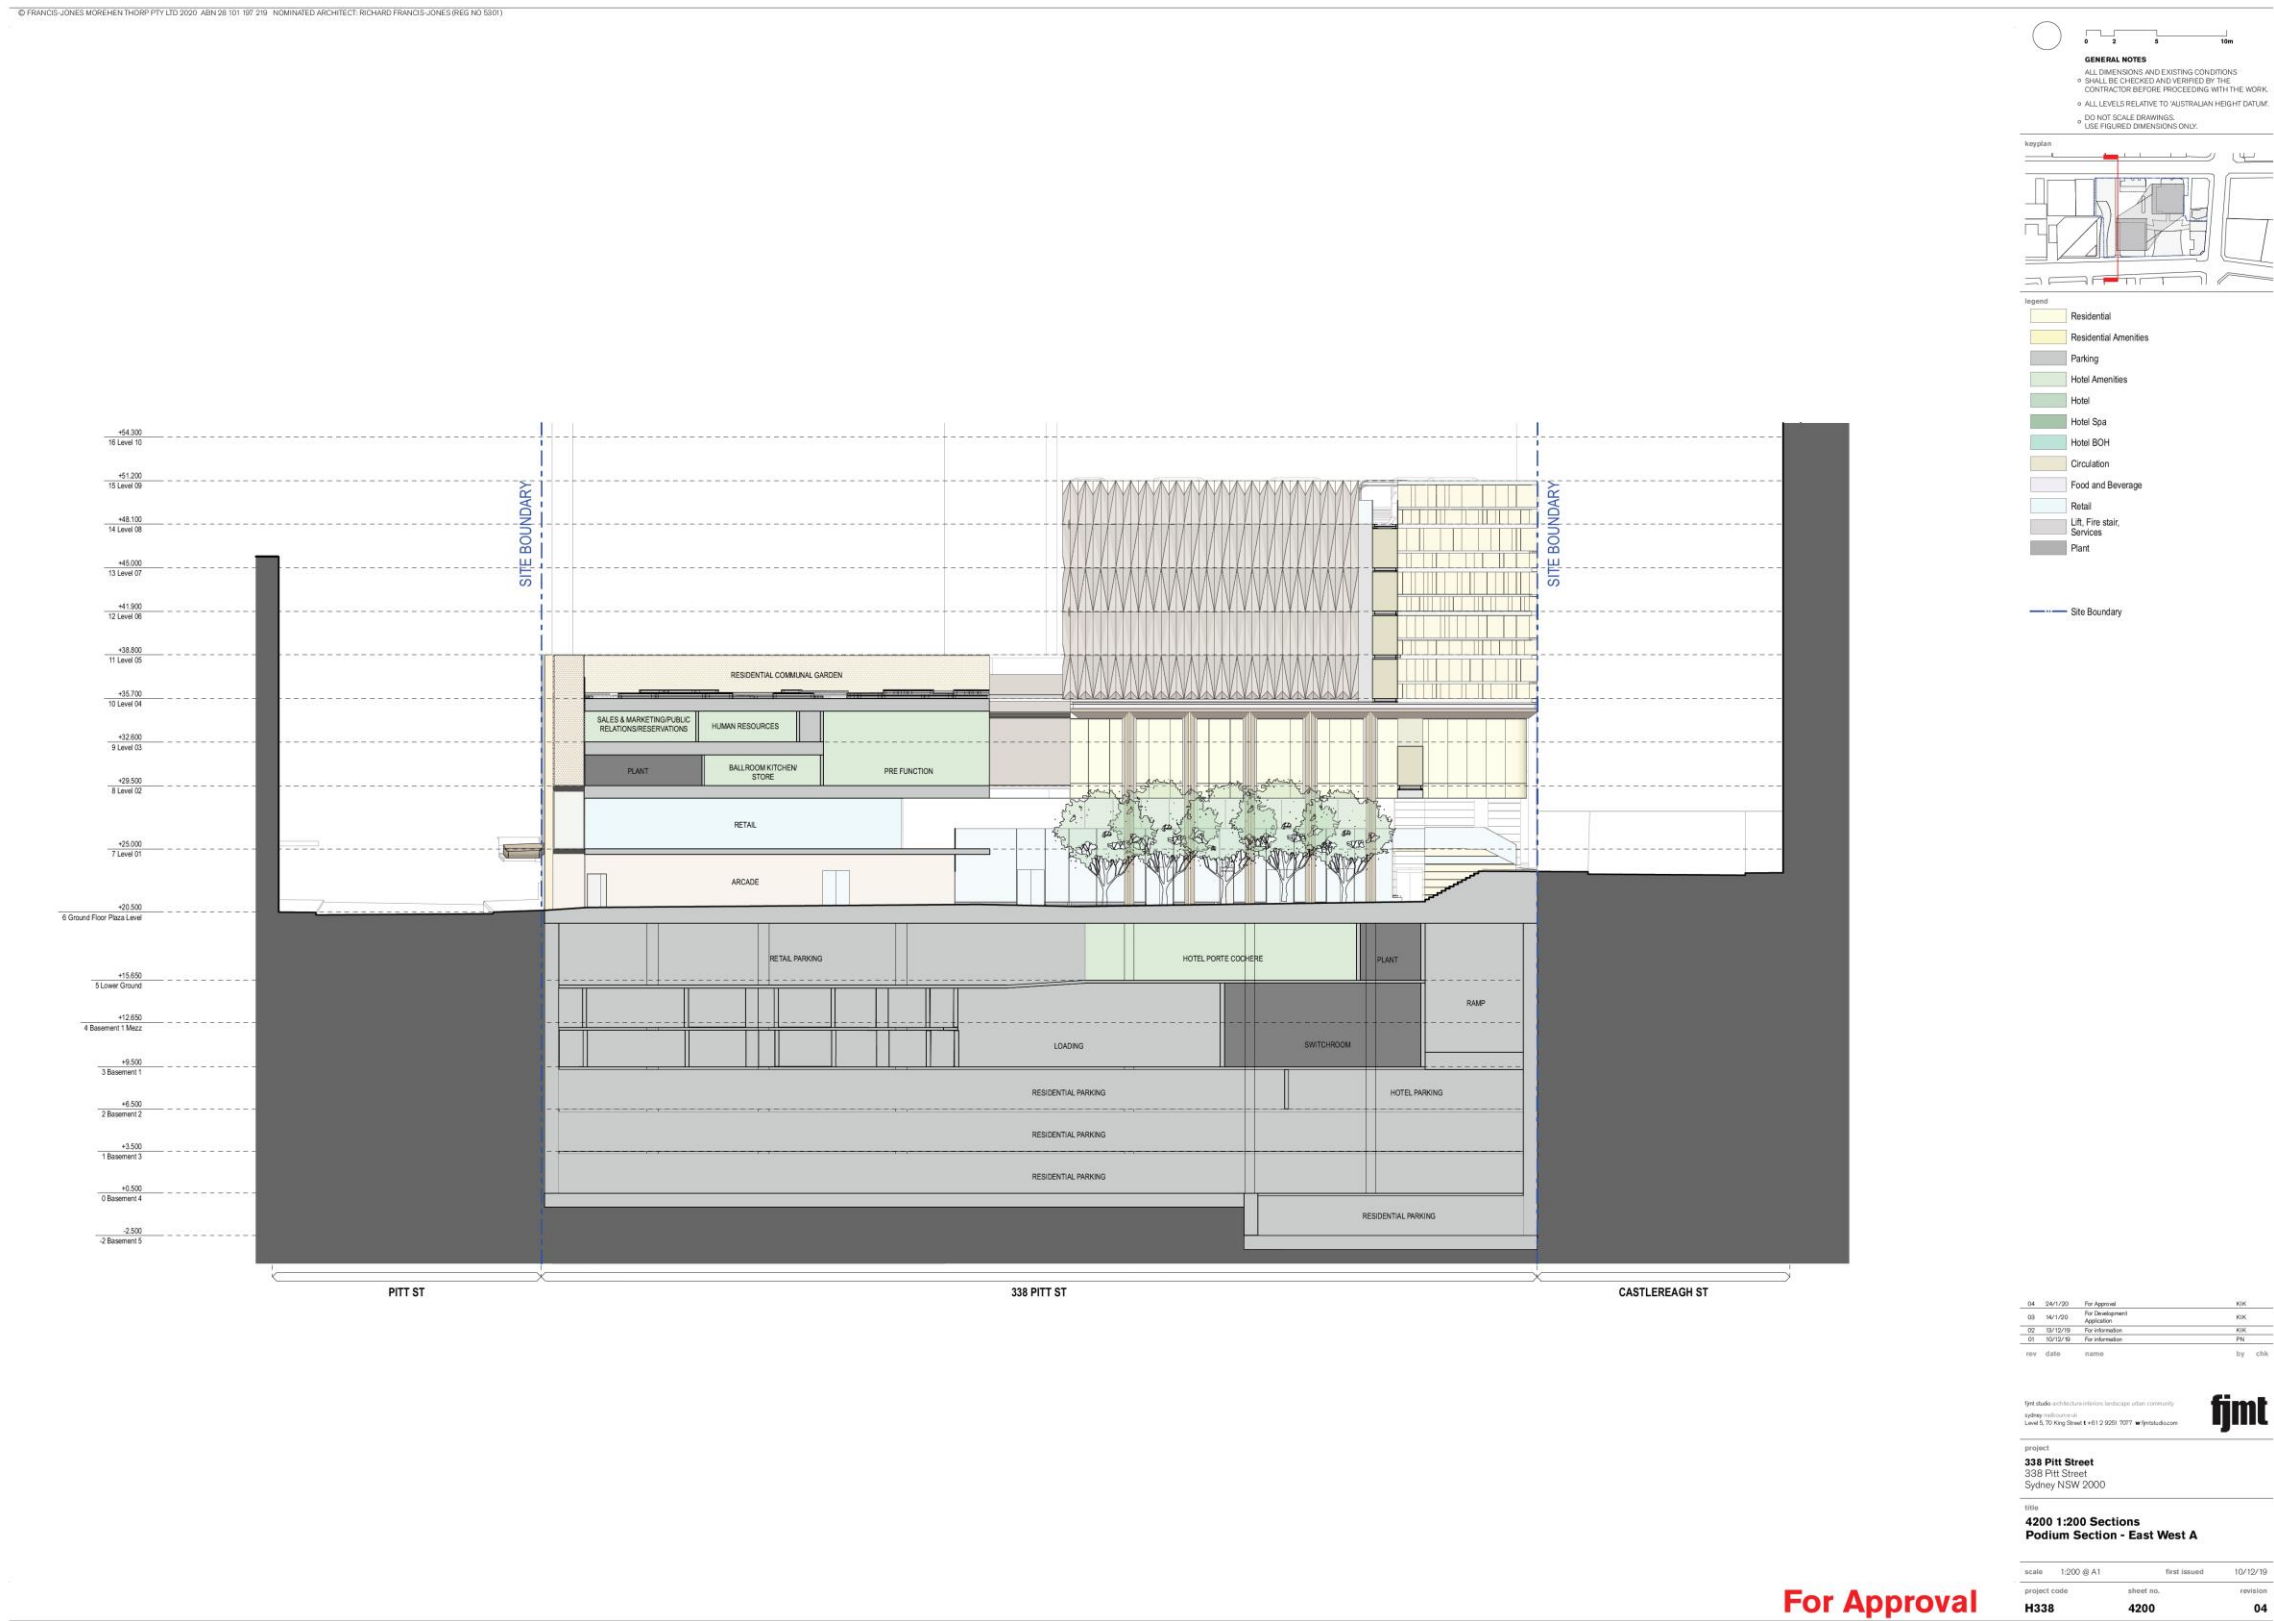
Podium Section – East West A showing layout of buildings and basement levels.
